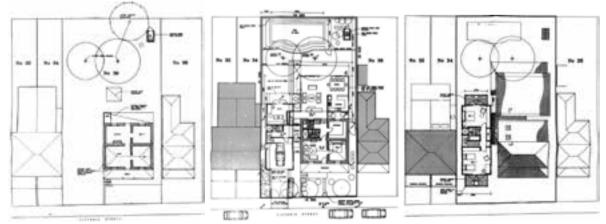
37 (From Left): Existing site/floor plan submitted in DA1131/93; proposed Ground Floor Plan; Proposed First Floor Plan in DA1131/93
